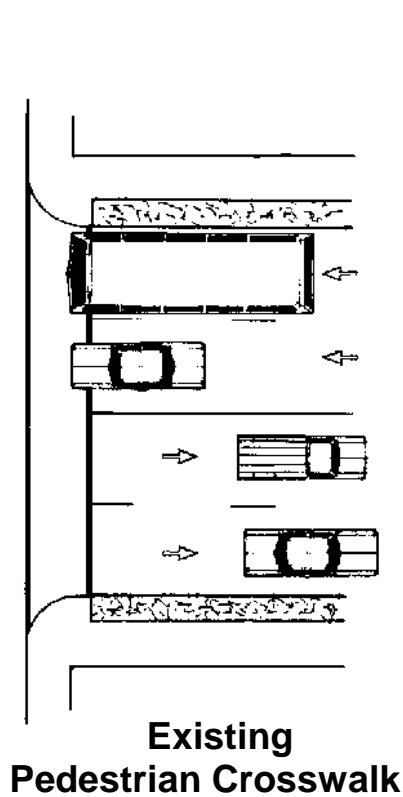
18 Existing plan view of a typical crosswalk and stopbar stripe.
